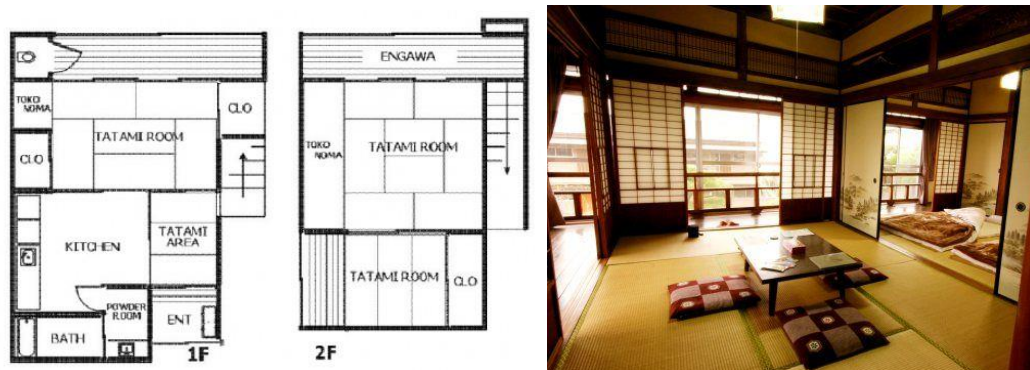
Interior and plans of a traditional Japanese house (URL:14).
